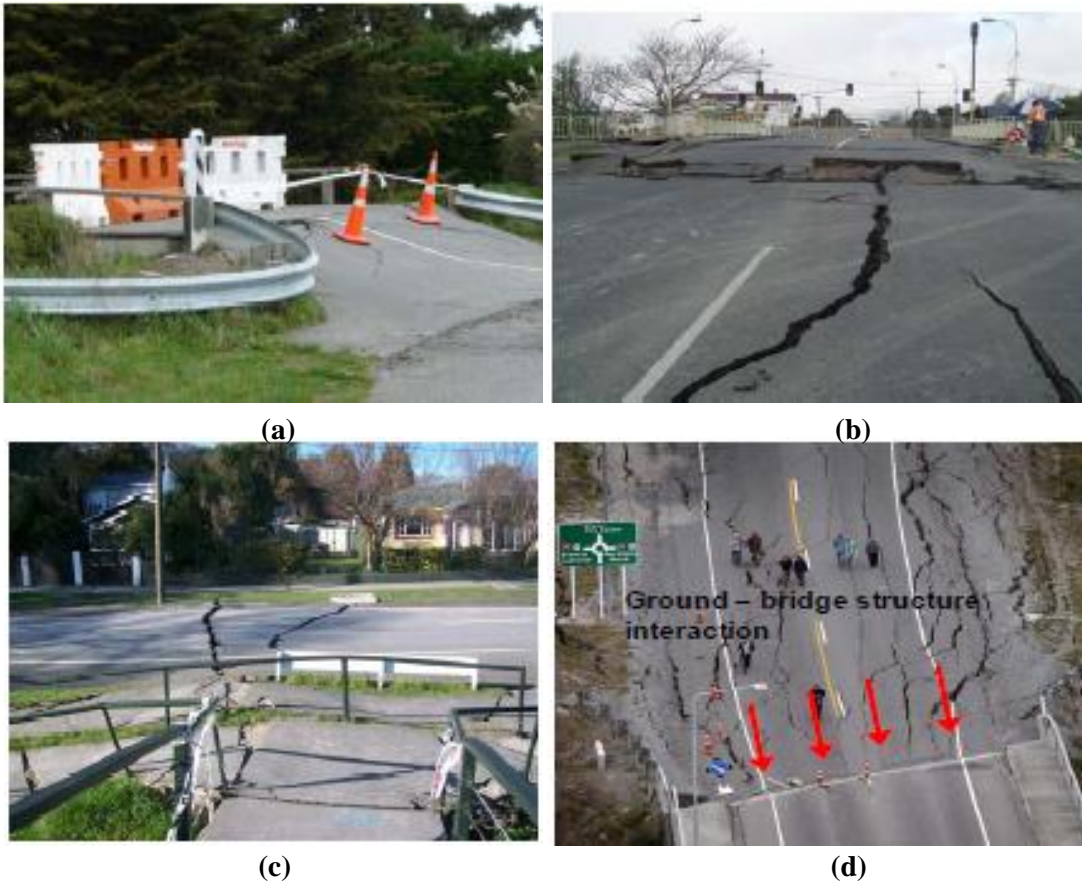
Relative vertical movement between approach and deck at: a) Davis Road Bridge, Lincoln [Photo by L. Wotherspoon]; b) Gayhurst Road Bridge [Photo by L. Hogan]; c) Bridge Street Bridge [Photo by L. Wotherspoon] d) Snell Bridge [Photo by M. Le Heux]
